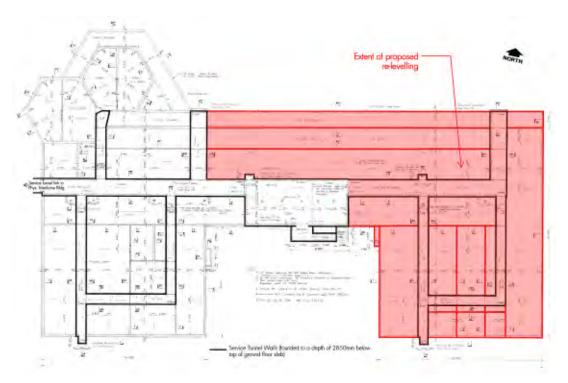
Foundation Plan – Damage Repairs
